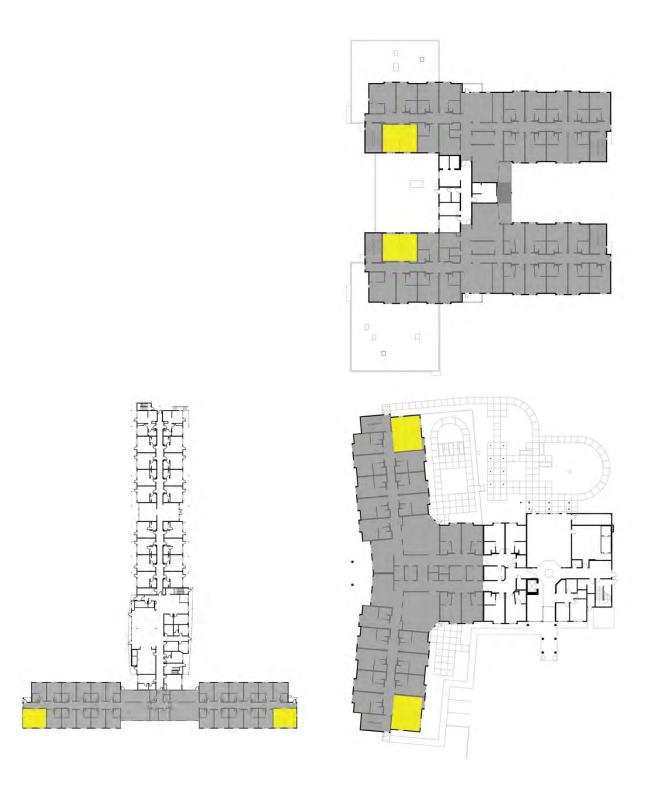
Couple Suite Location in Three buildings Couple suite on the upper floor of Red Deer building (right-up); Couple suite in Wainwright building (left-down); Couple suite in Slave Lake building (right-down).
